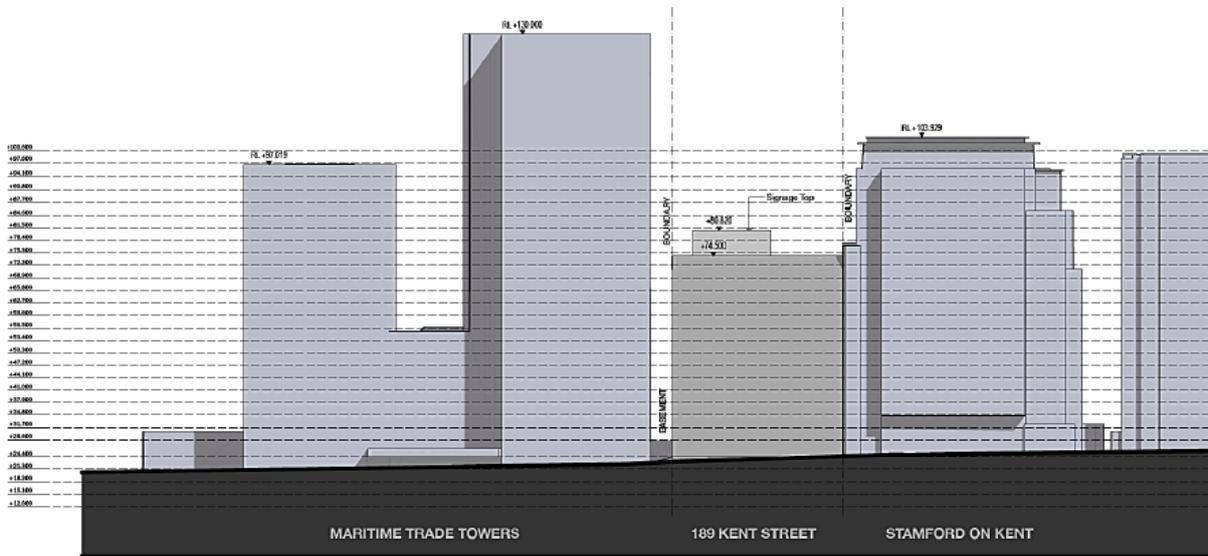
Extract of existing streetscape elevation to the western side of Kent St
